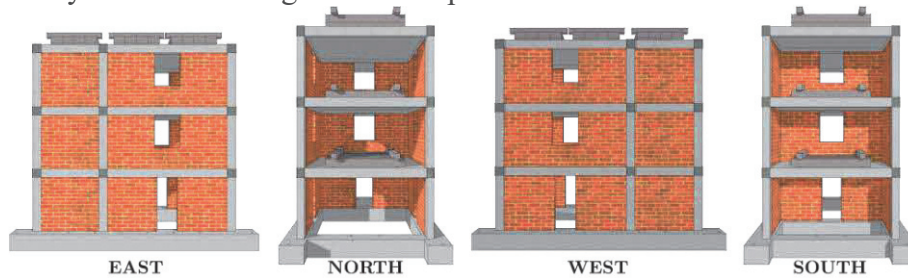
3 storey masonry-infilled RC frame and reinforcement details Lateral views.
